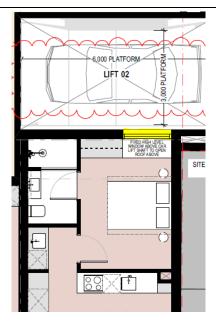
excerpt from Ground Floorplan of the Decision Plans, window of G.02 highlighted in yellow
